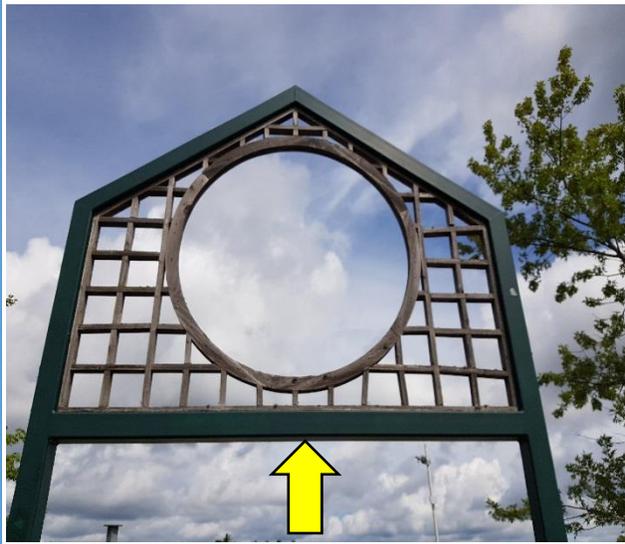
View of lead-containing dark green paint on metal beams throughout the subject areas.
